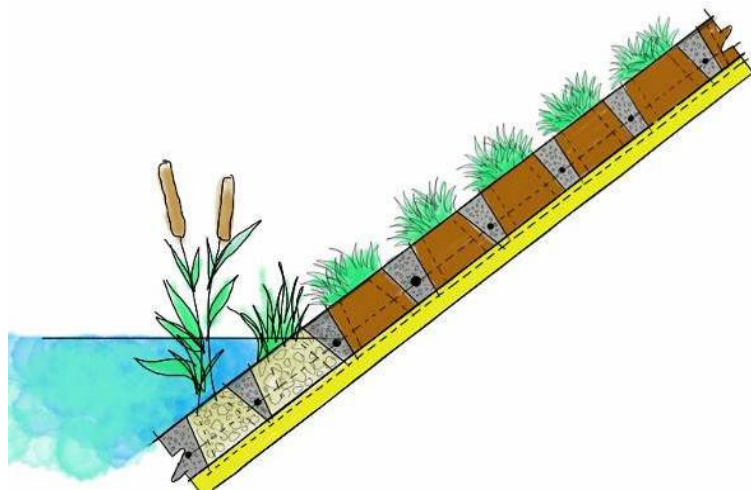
GRASSED CELLULAR CONCRETE PAVING AT EMBANKMENT
